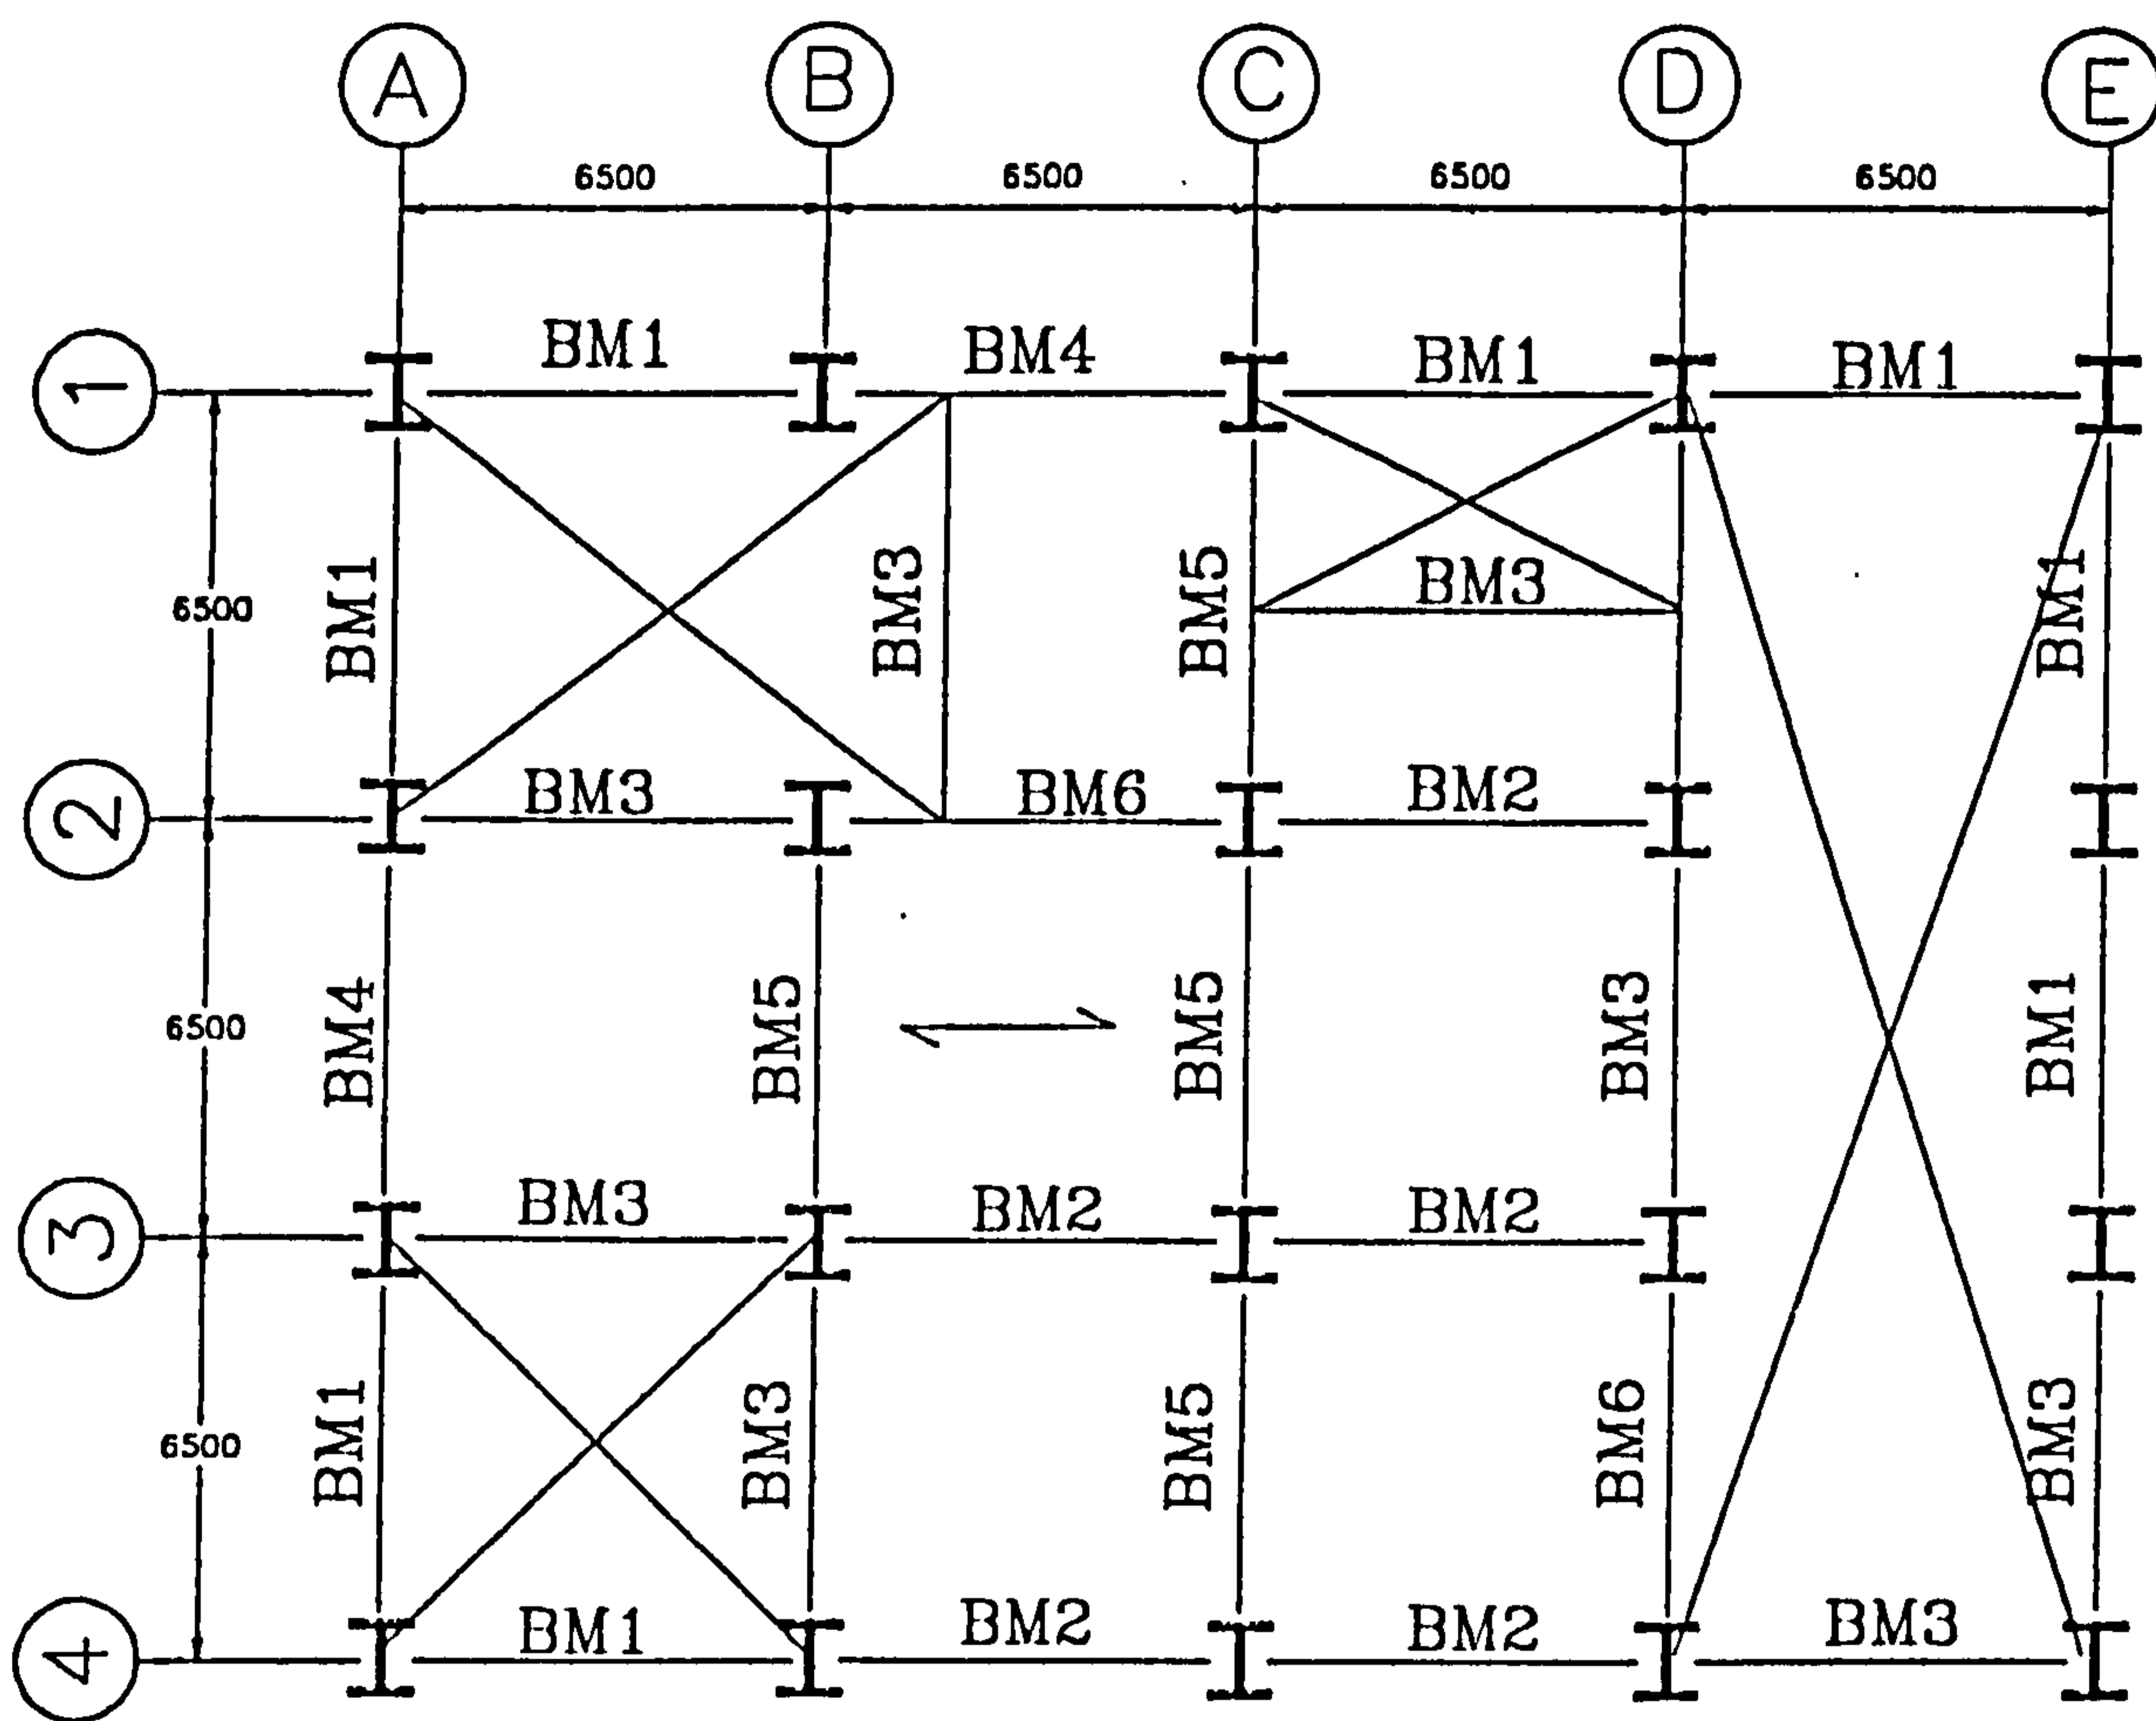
Typical Floor Layout of M.R.I. Building in Nottingham
